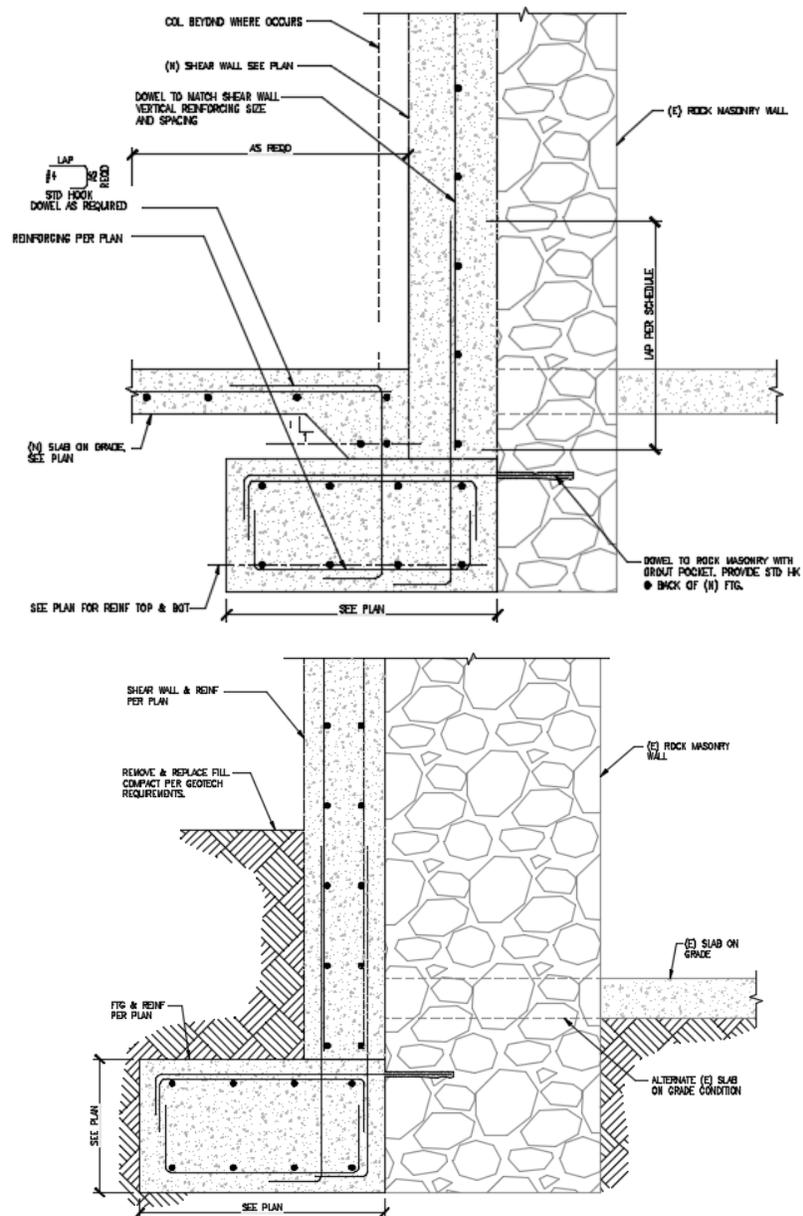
Add ductile footing and concrete shear wall and connect with Stone Masonry Wall
